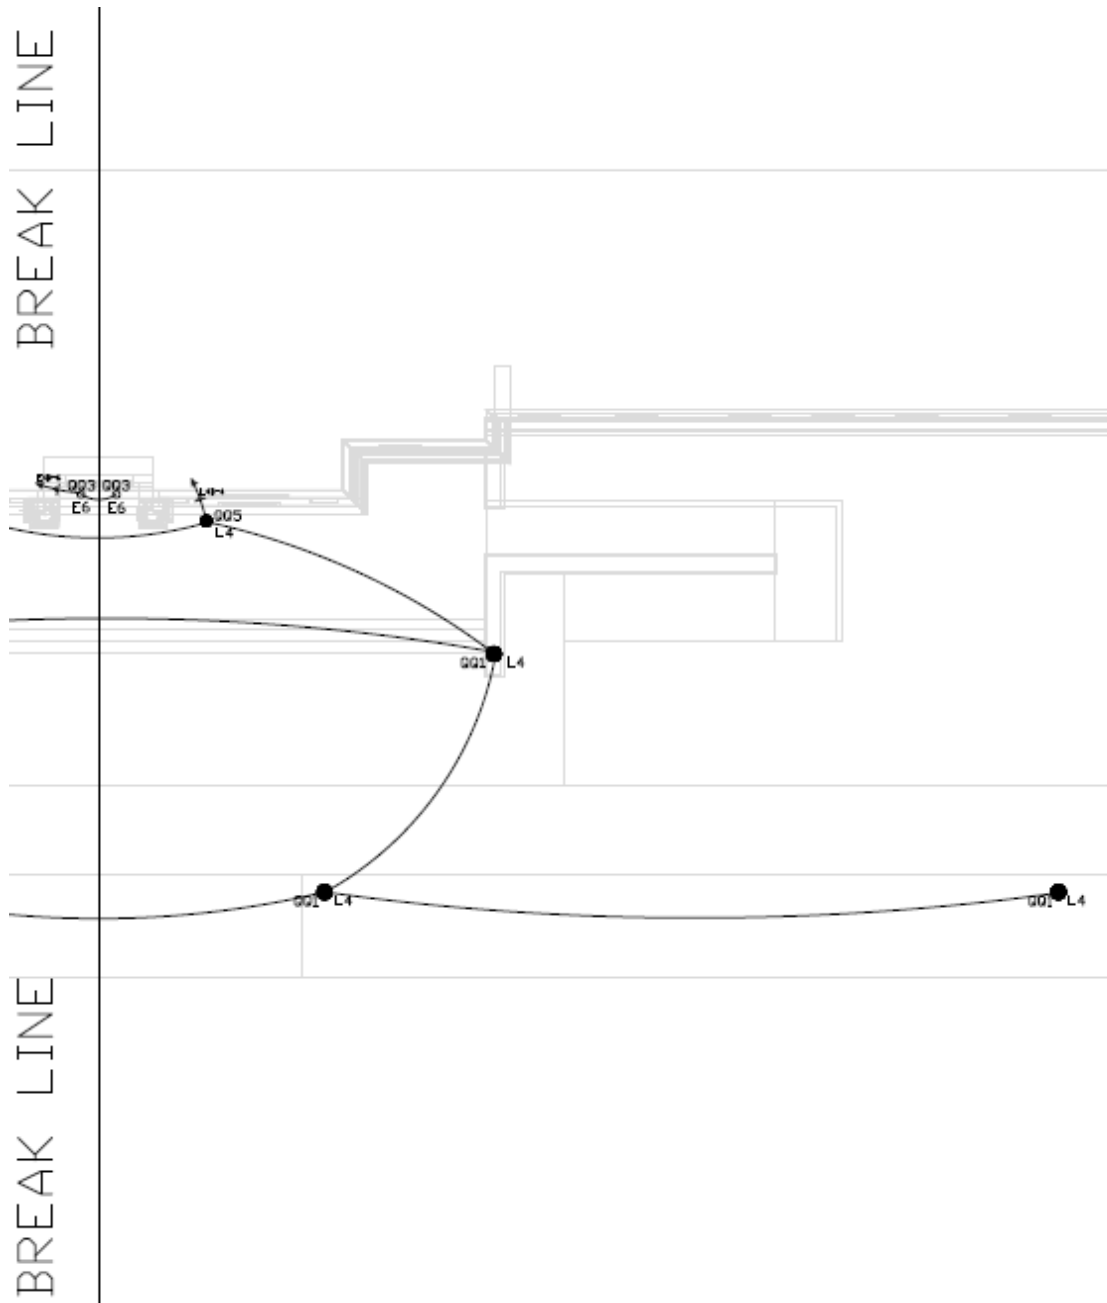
First Floor Circuiting Plan for East Entry and Façade – North Of Entrance
